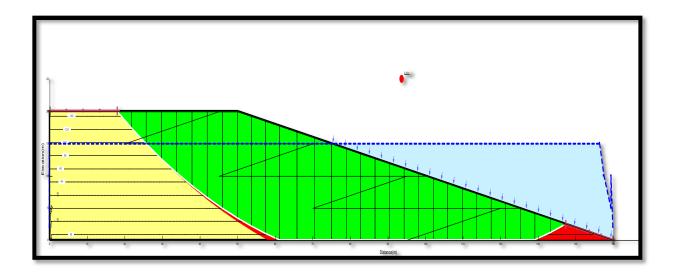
Embankment cross section for 1:5 slope at 15 m water leve
